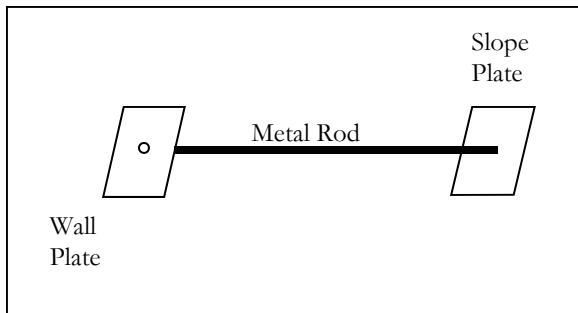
A. Cross Plate Anchor. A double plate anchoring system connected by a metal rod. Rod is driven through undisturbed soils to connect plates.
